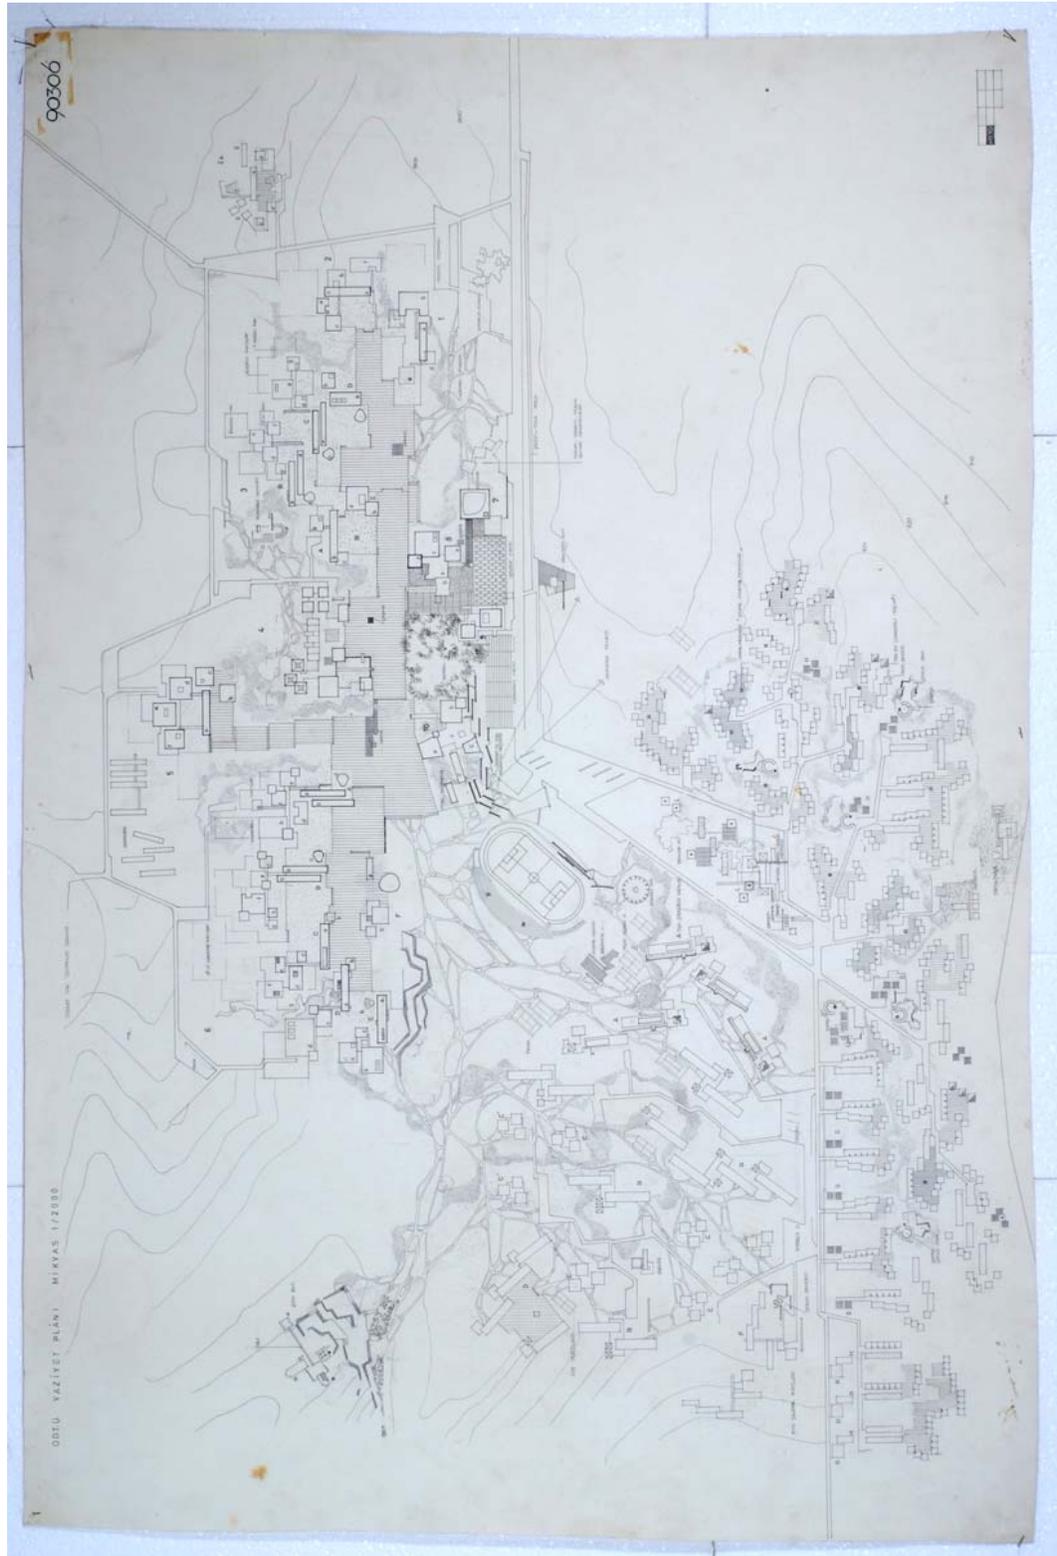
The original Çinici site plan (Vaziyet Planı; 1/2000) for the second METU competition (Source: Çinici office archives).
